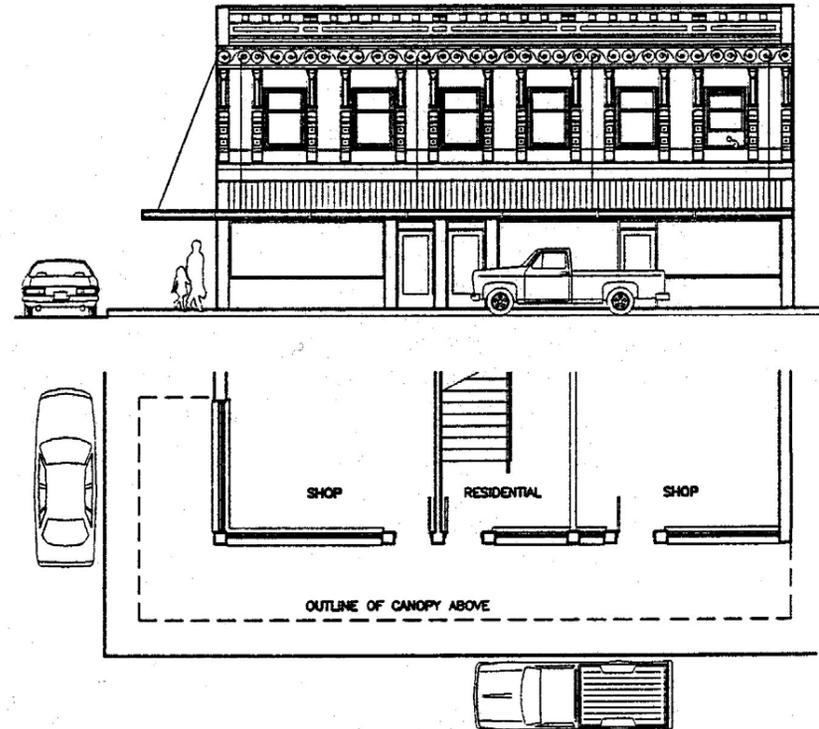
The canopy turns the corner of the building so as to provide continuous storefront protection from the weather.
